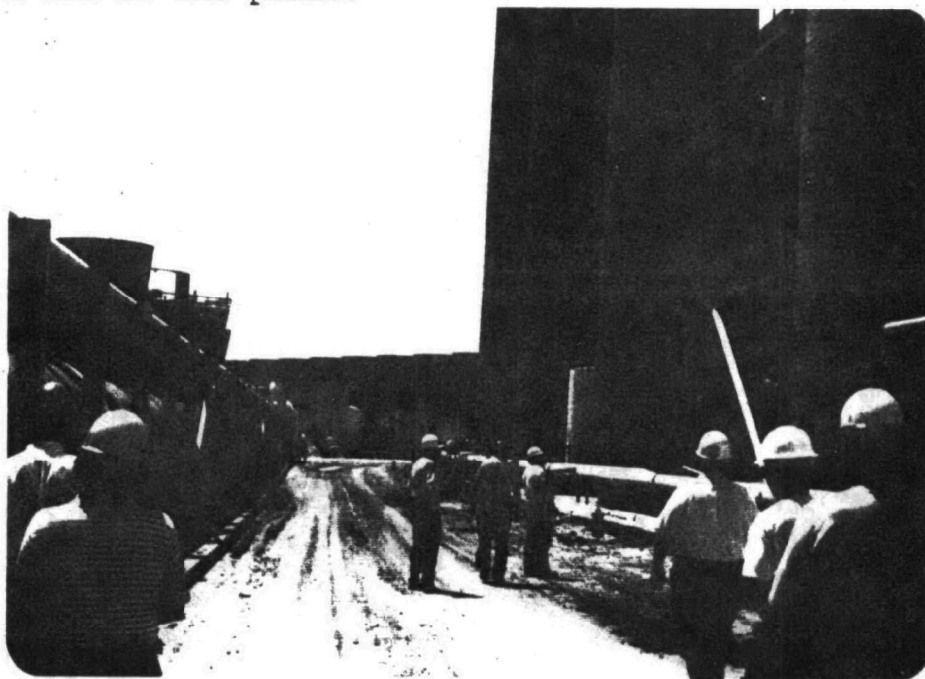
View from ground level facing south showing available space behind Stacks 1, 2, 3, and 4 on the east end of the plant.
